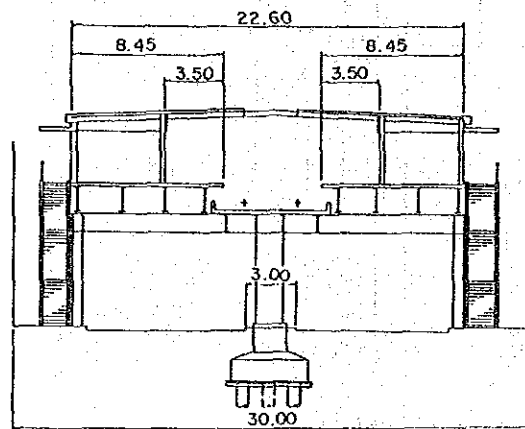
TYPICAL STRUCTURES OF TRACKWAY AND STATIONS
